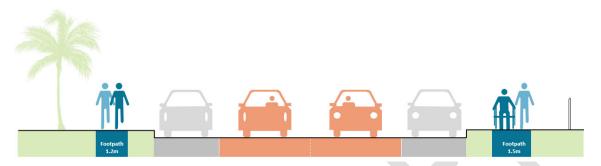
Example cross-sections of a 1.2m and a 1.5m pedestrian footpath
